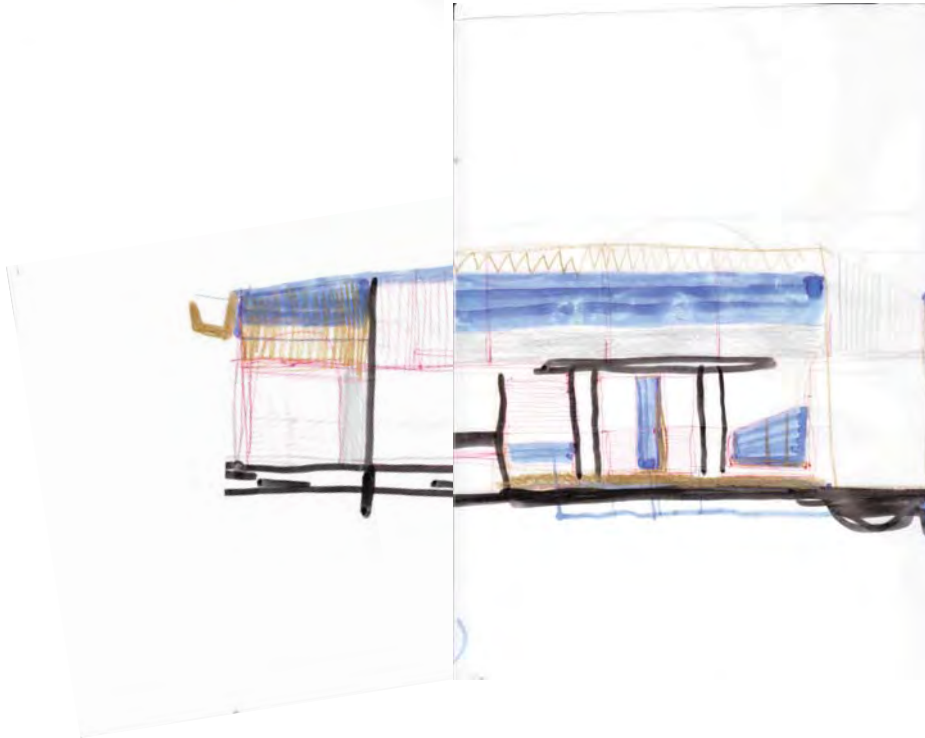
Conceptual elevations for the building north and south. Gold represented plastic construction, blue is that of aperture or transparency, red is brickwork and black concrete.
